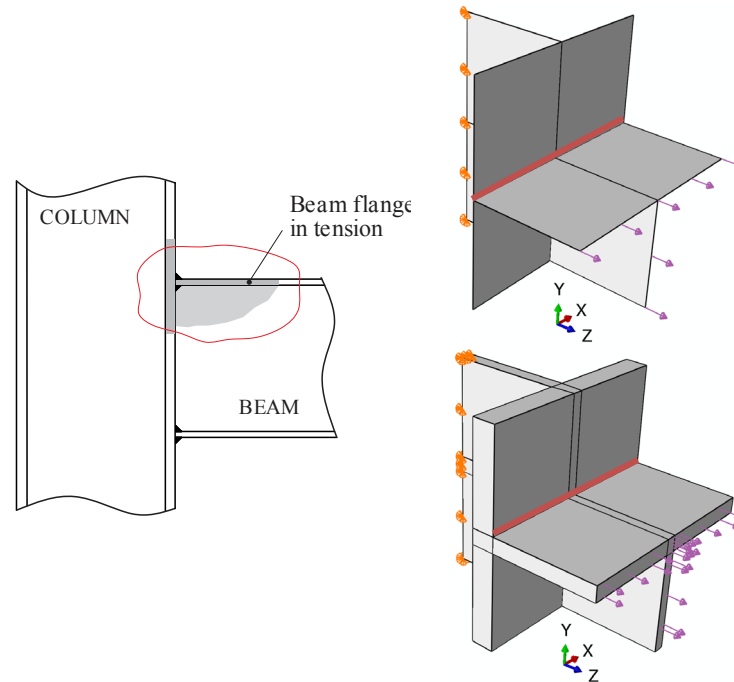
Position of the sub-model in a beam-to-column joint; shell and solid sub-model geometry with the interface between beam flange and column flange marked as well as boundary conditions and load applied
